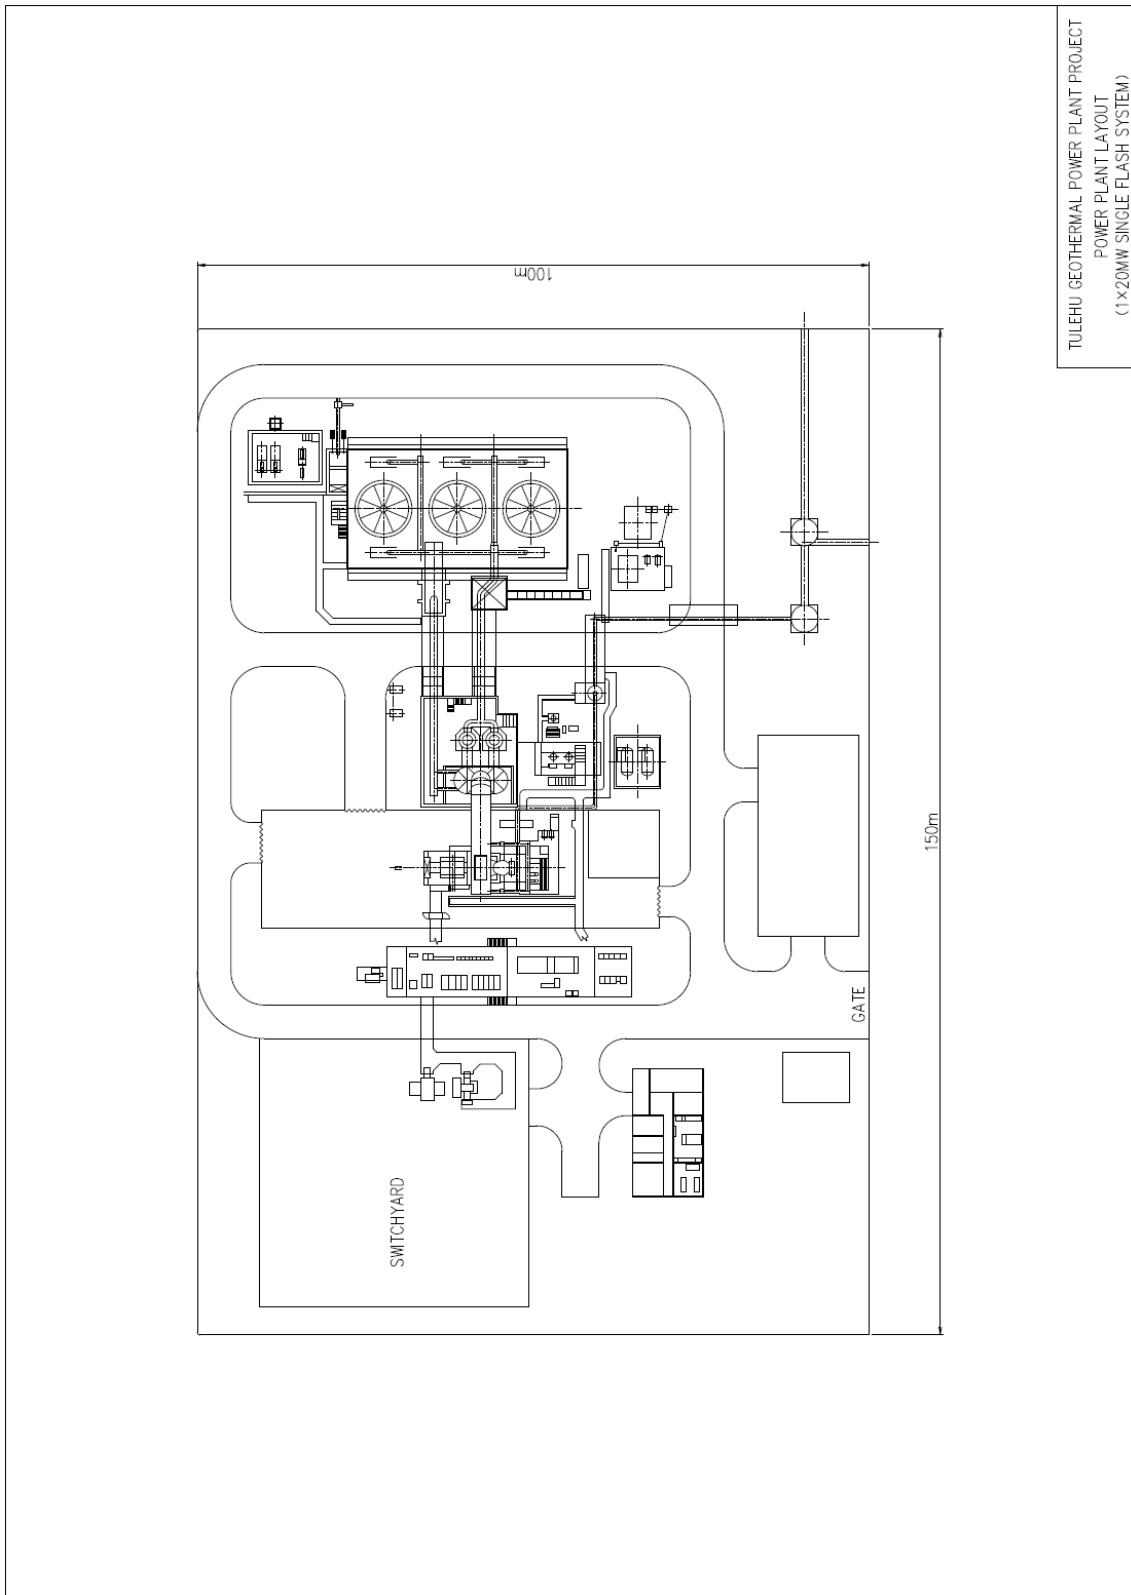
Power Plant Layout (1 x 20 MW Single Flash System)
